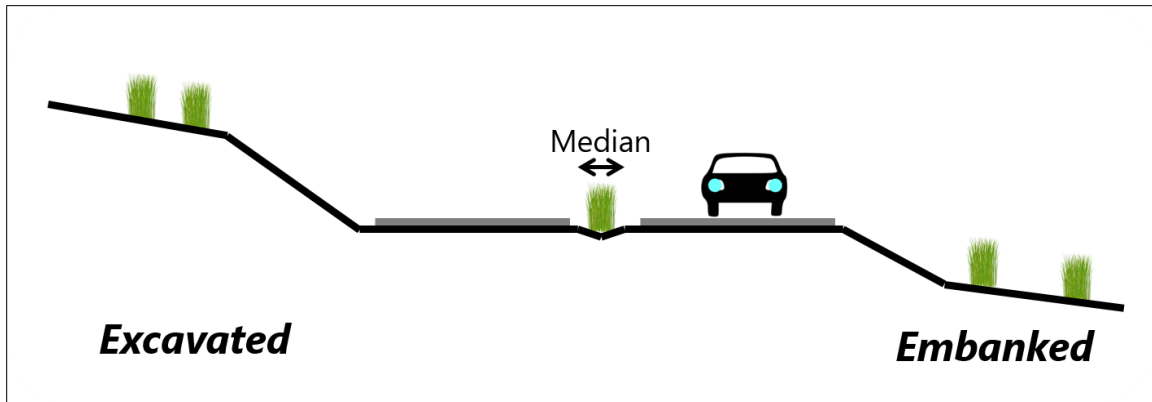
Schematic illustrating excavated and embanked portions of a roadway. The roadside verge rises above the road surface when excavated and sinks below the road surface when embanked.
